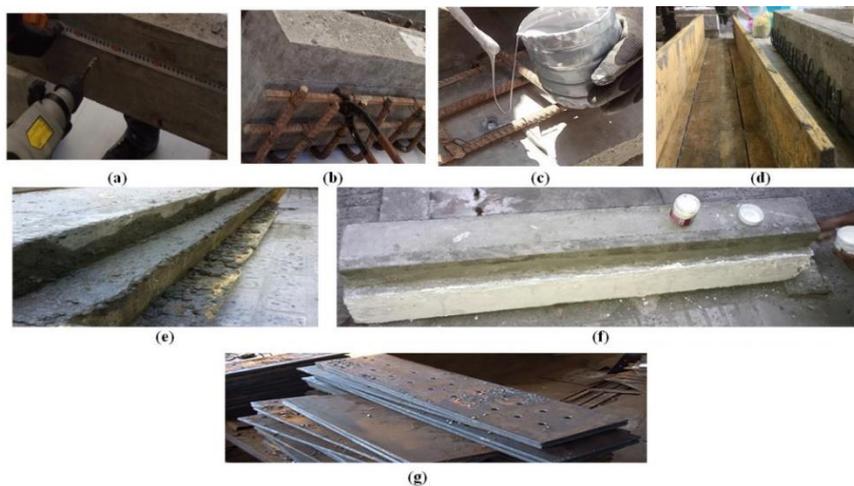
Preparation of concrete jackets a: Creating a hole on the main beam to install a concrete jacket b: Making and installing a steel jacket on the main beam c: Pouring epoxy paste into the hole d: Making mold for installing concrete jacket e: Concrete pouring of concrete jacket f: Preparing concrete beam retrofitted with concrete jacket g: Steel sheet with holes
